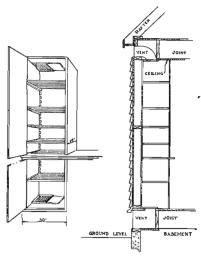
Draft cooler. (A) Perspective. (B) Cross section.
